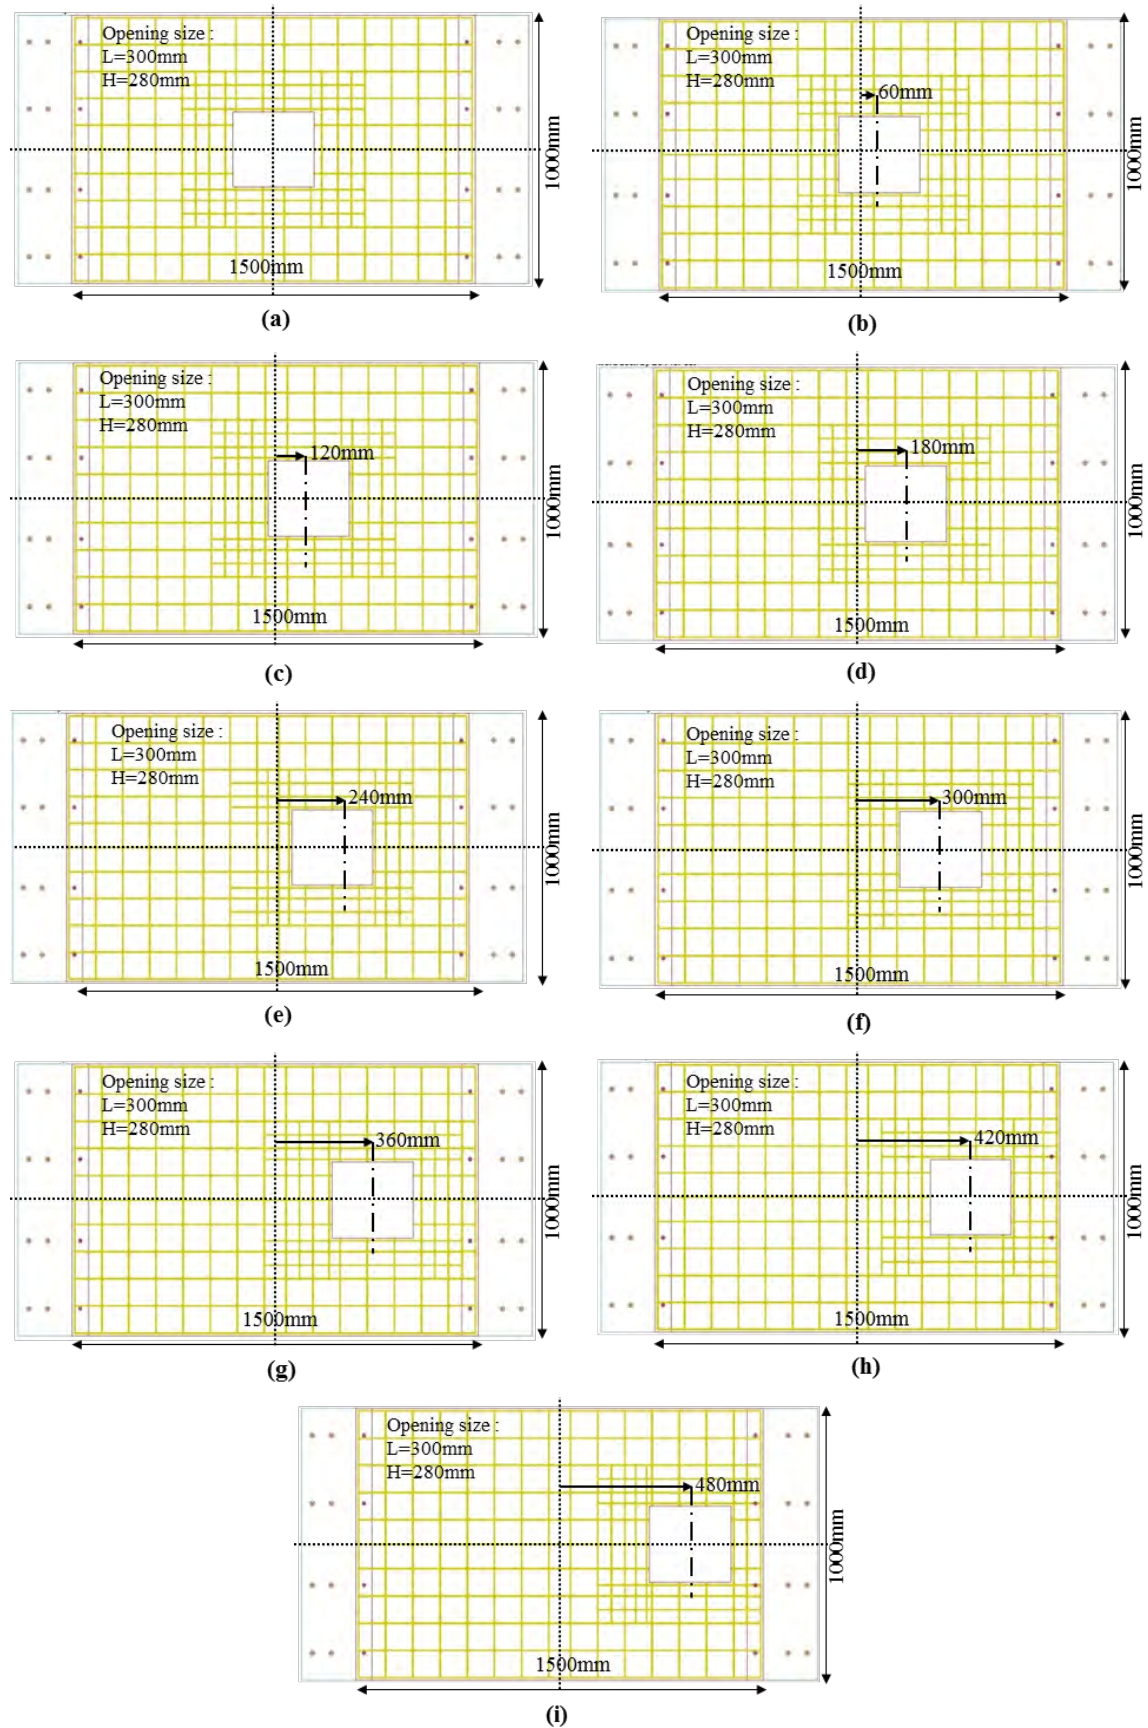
Details of stiffened opening location-Longitudinal direction (rotated front view)
